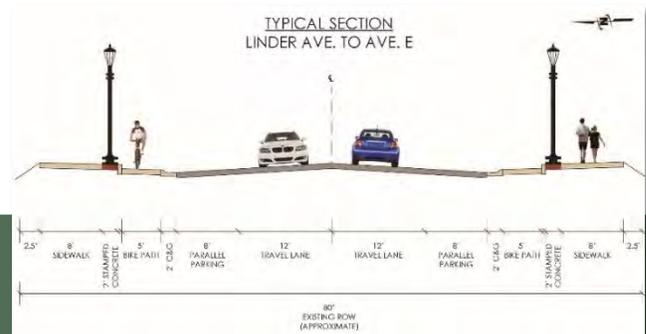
Possible Typical Section for 4th Street from Linder Avenue to Avenue E – larger version can be found in Appendix A
